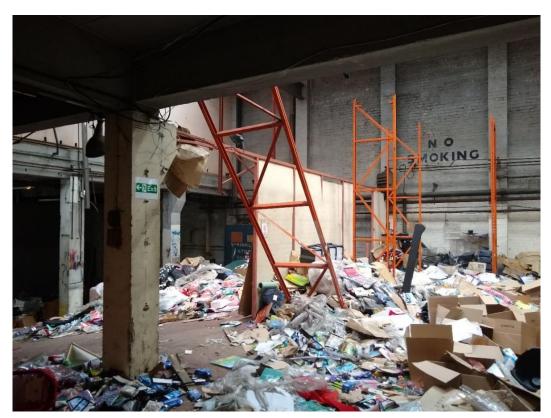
View of the main ground floor over the loading bay (to the left) in Building 6
